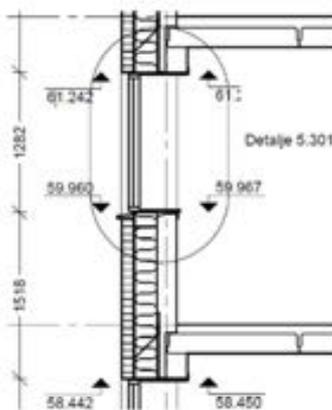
Wall section: 190 mm new insulation material plus exterior solid standard bricks. Windows – plastic, triple-glazed energy glass.
